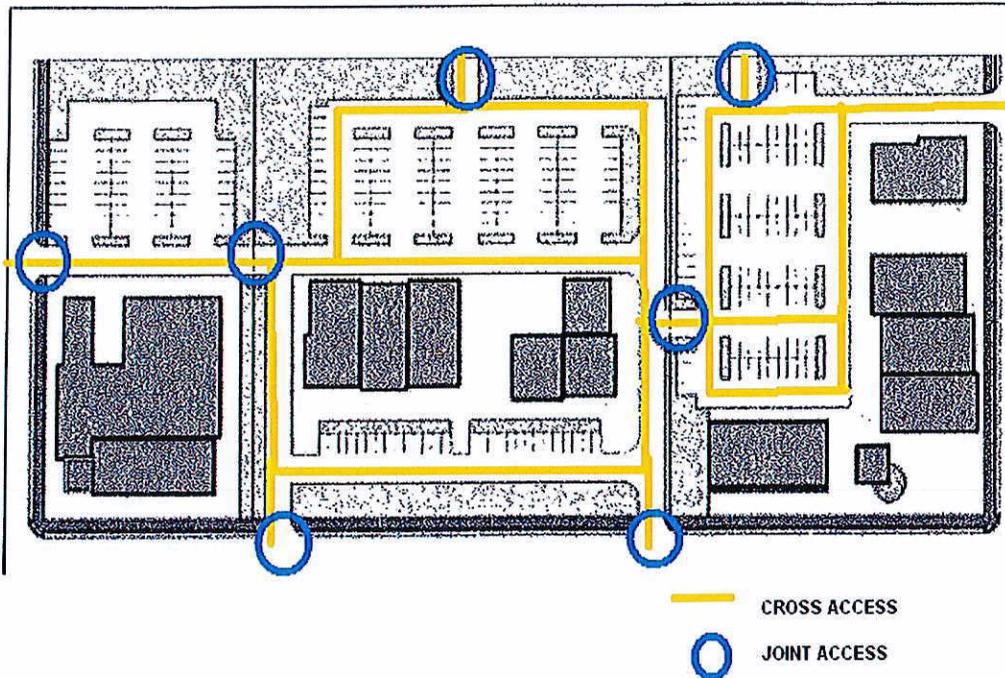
Cross access between parking areas and adjacent properties. Joint access through the use of common driveways entrances and between properties.
